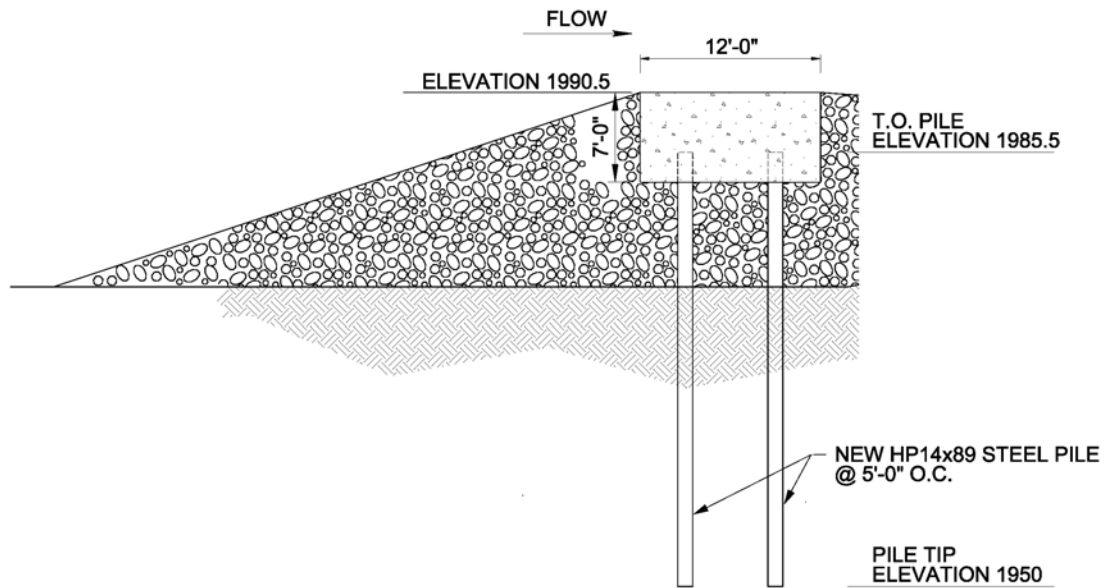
Cast-in-Place Reinforced Concrete Dam
